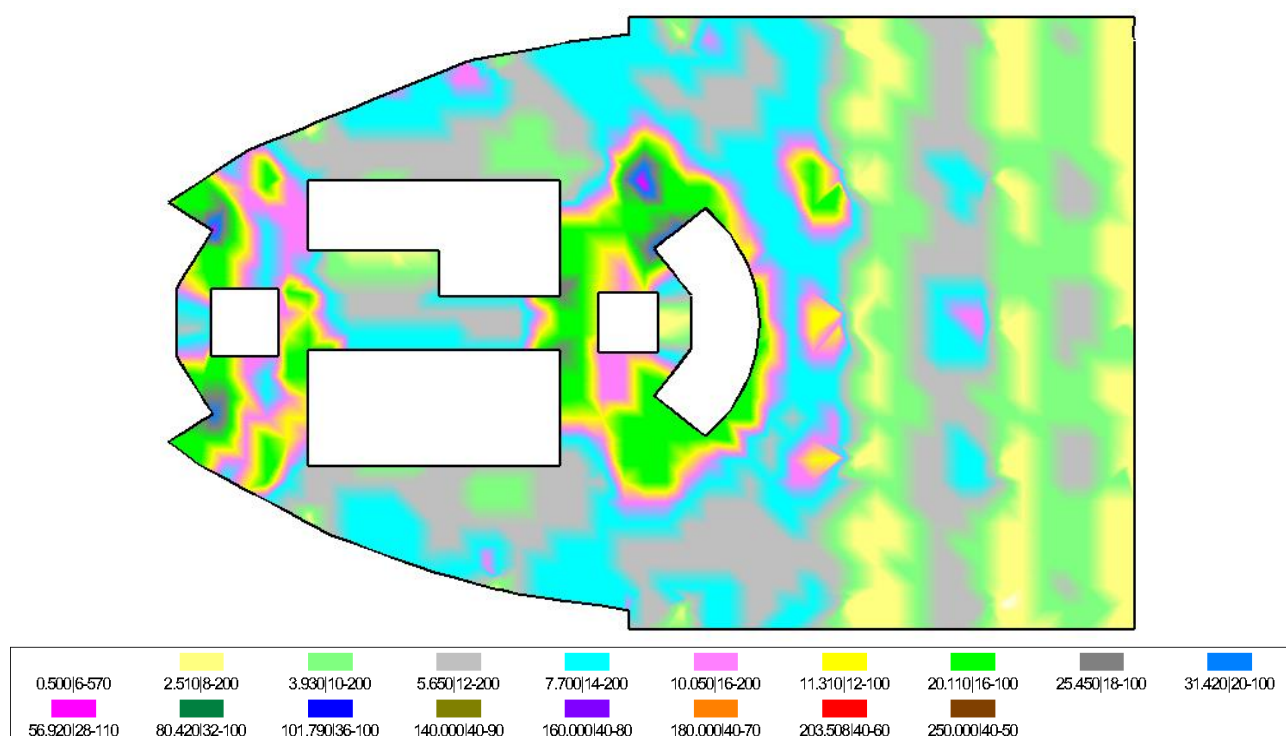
Reinforcement of the floor slab of the eastern tower at +42.80 m. Lower longitudinal reinforcement in the direction of the axis R, cm^2/m [15]
